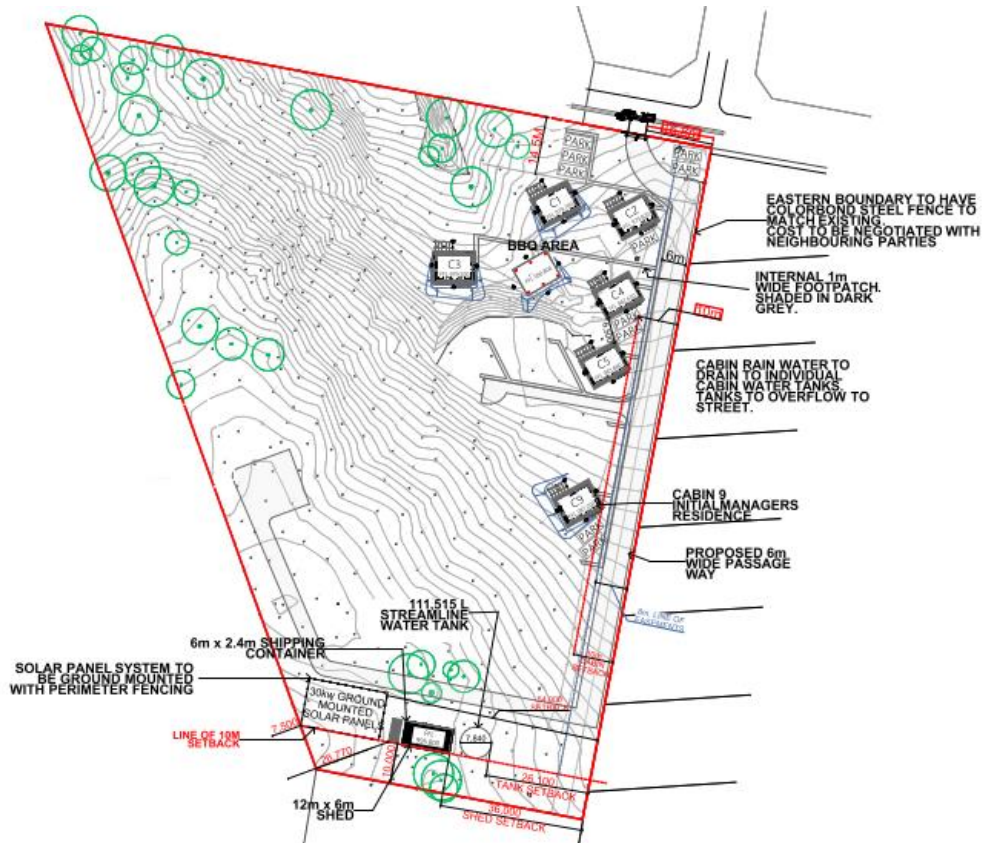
Proposed Site layout – Stage 3 Cabins 4 & 5
